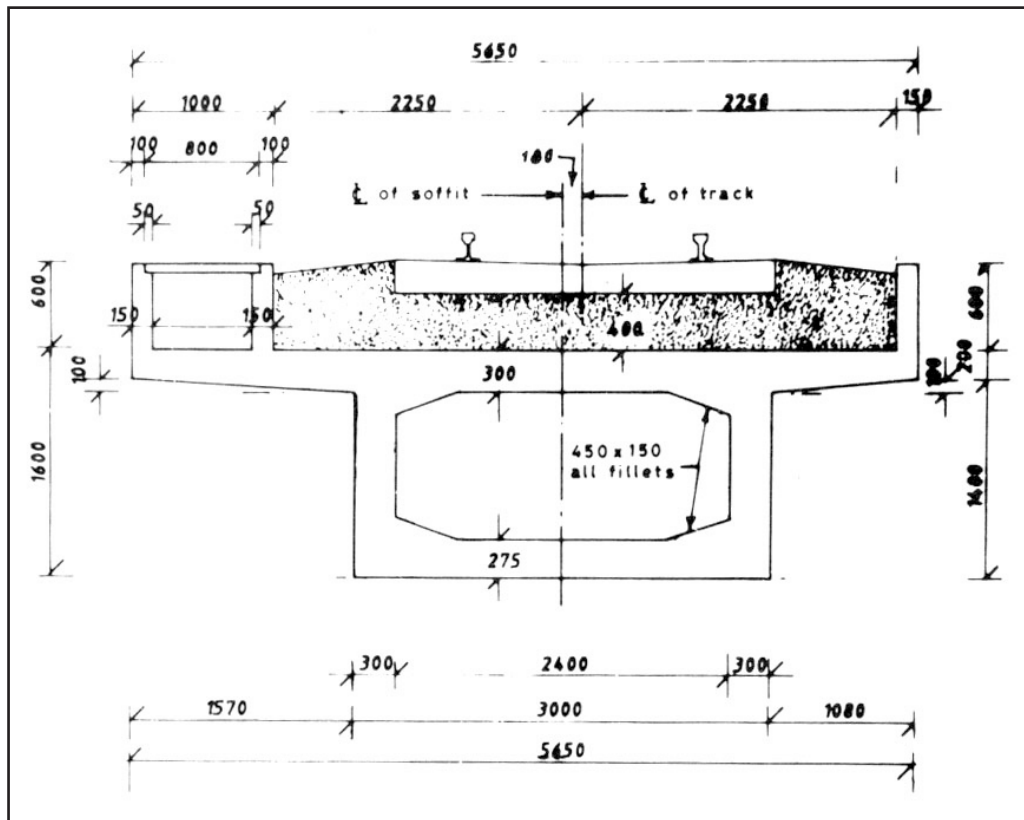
(b) Cross-section for road-under bridge for 26-m span PSC box girder
